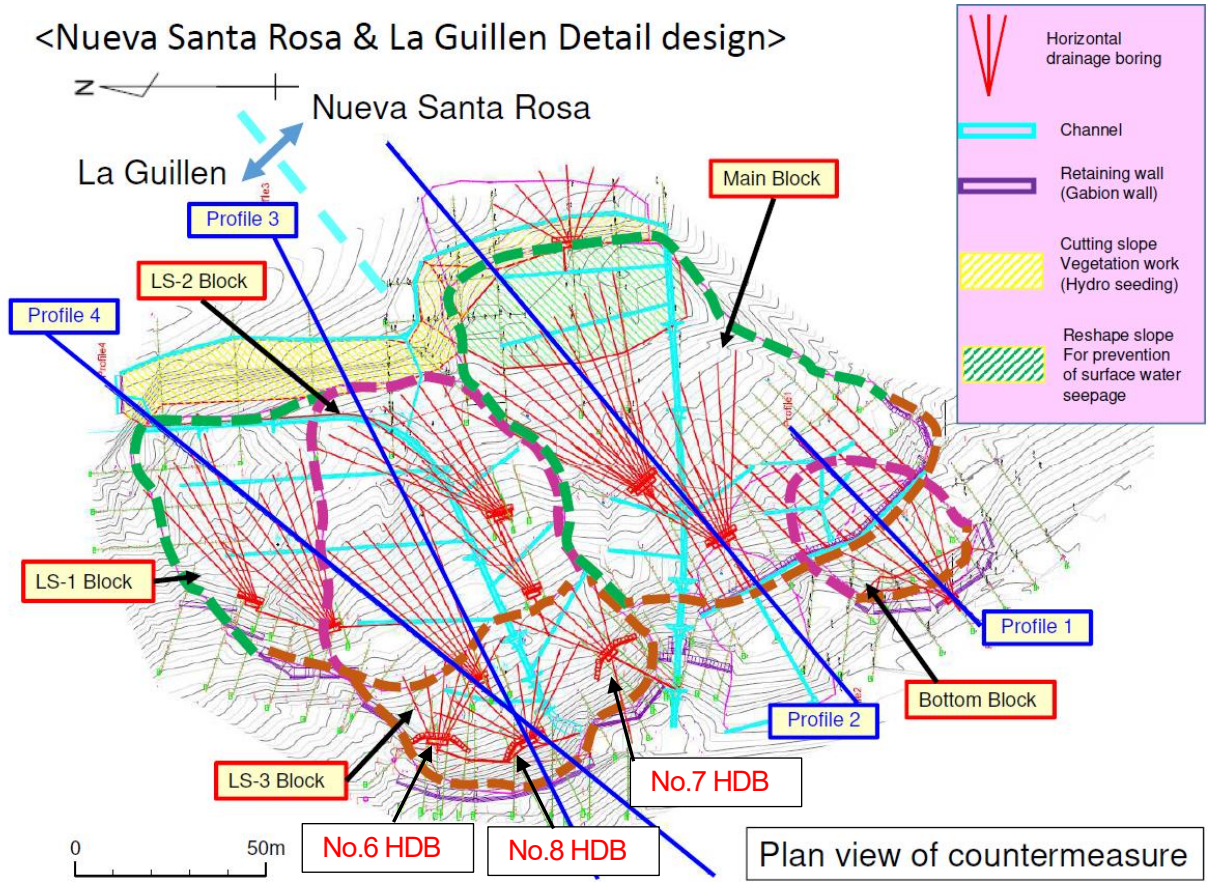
Plan view of countermeasure (La Guillen, Nueva Santa Rosa)
